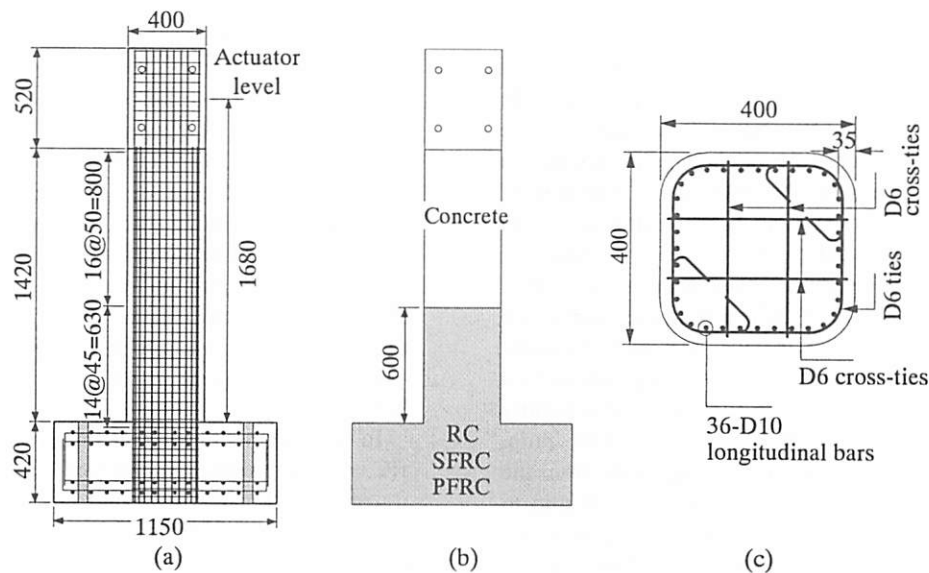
Specimen configuration and details: (a) reinforcement detail, (b) concrete/composite property, and (c) cross-section
